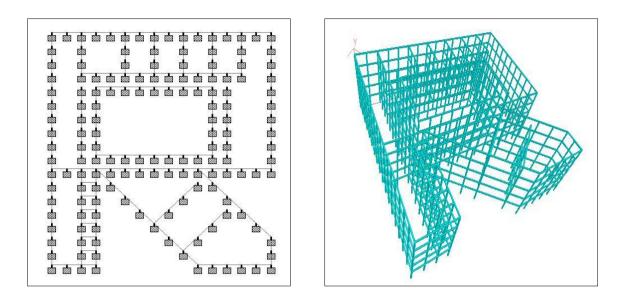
Plan map for the R-Block in STAAD.Pro Figure 2.2 The 3-D view of the structure with 5 floors (R-
